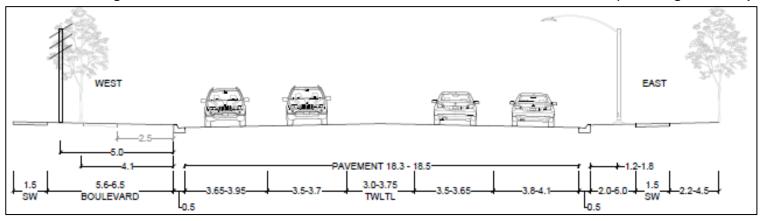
Existing Cross-Section Intersection of Cawthra Road at Atwater Avenue (north leg)
